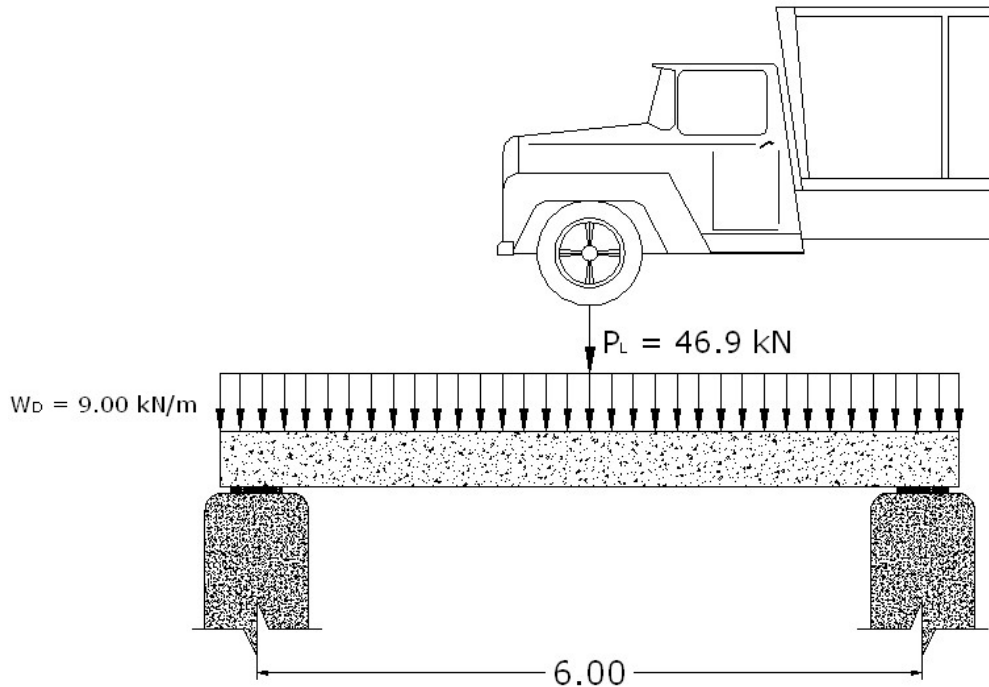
Simply supported bridge for Example 4.4-2.
